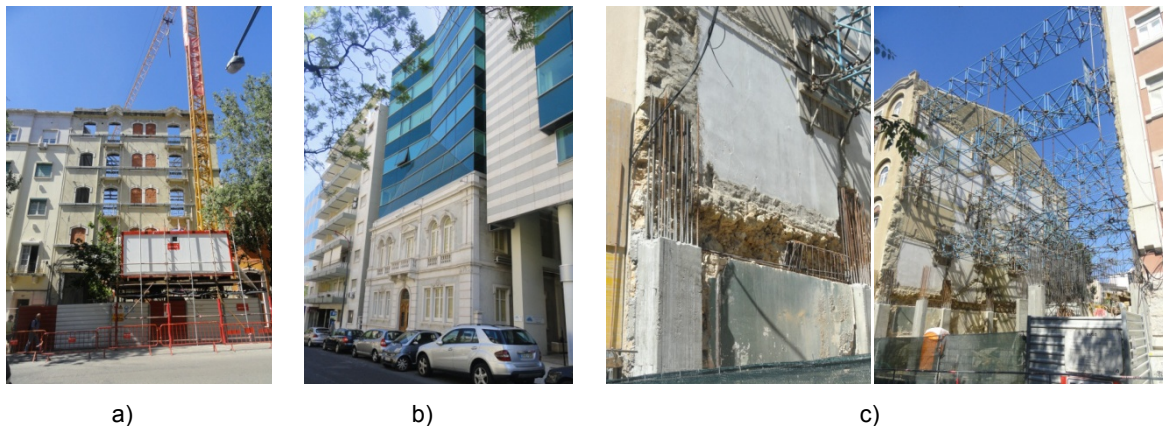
Structural modifications: a) Preservation of the façade wall; b) Introduction of new storeys; c) Partial demolition of the side masonry wall to build the new reinforced concrete structure.
